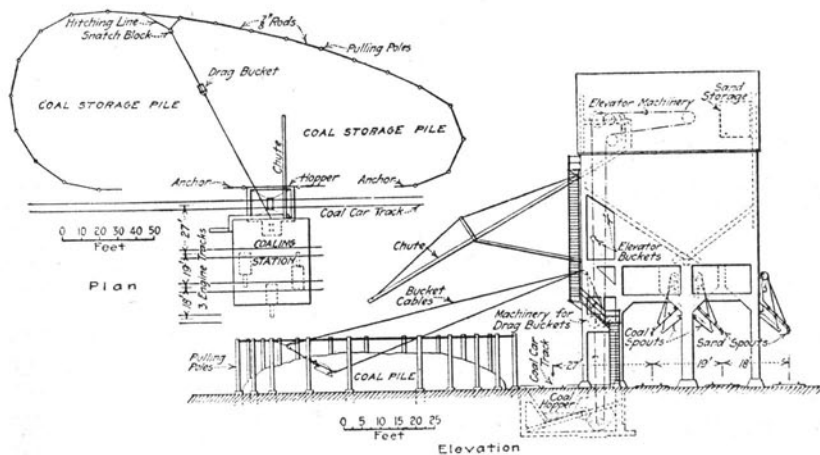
PLAN AND SECTION OF COAL STORAGE AND COAL HANDLING PLANT OF SOUTHERN RAILWAY AT AIR LINE JUNCTION, VIRGINIA
